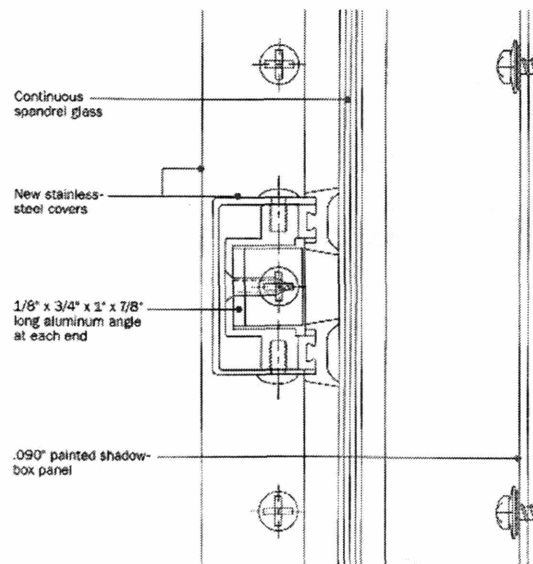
New Spandrel Glass Mullion Detail of Lever House
